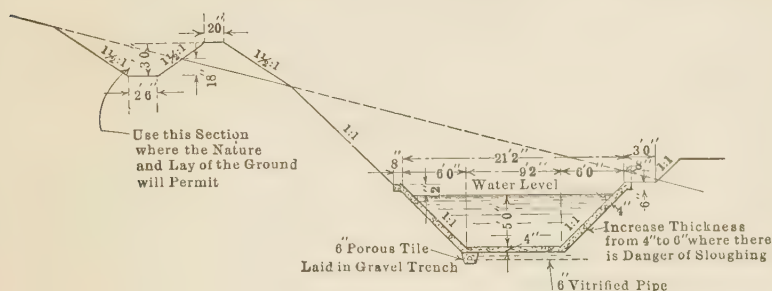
Concrete lined canal, with intercepting drainage ditch. Naches Power Co., Wash.
